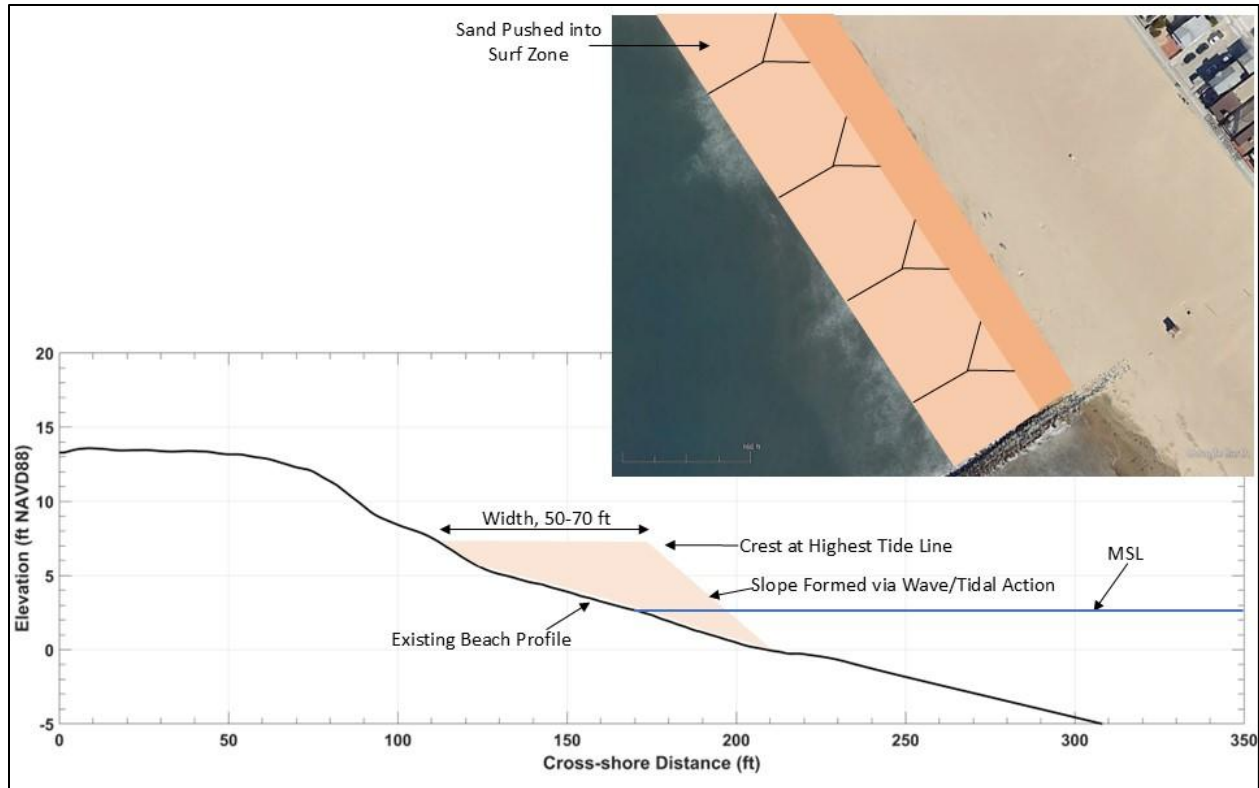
Beach Dike Design Plan View and Cross Section
